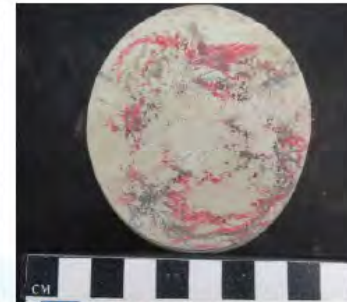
B: Core No. 1 – Top surface, as received.
